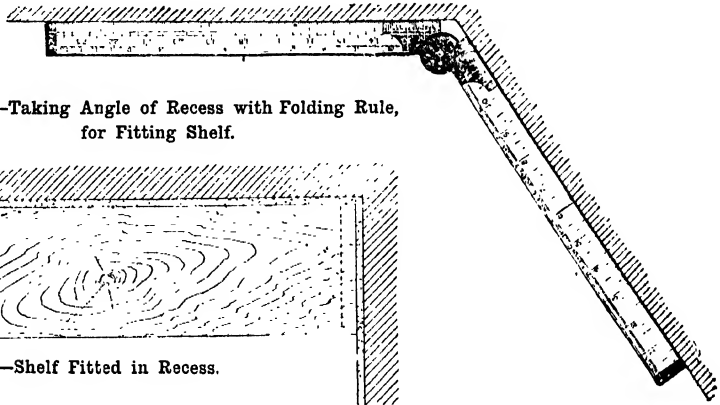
Taking Angle of Recess with Folding Rule, for Fitting Shelf.
